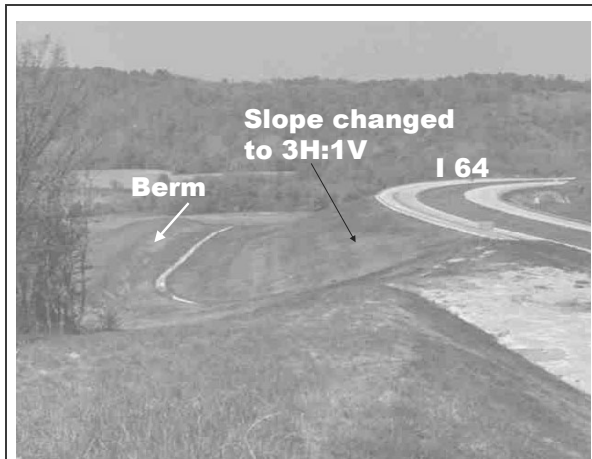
View of berm used to repair I-64 embankment failure (after Hopkins 1973).
